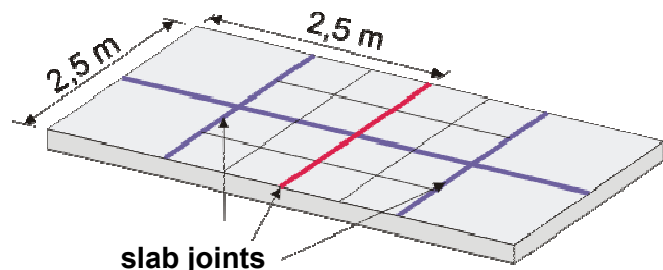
Simulated fatigued “old” concrete pavement consisting of eight 20 cm thick concrete slabs with elastic foundation.
